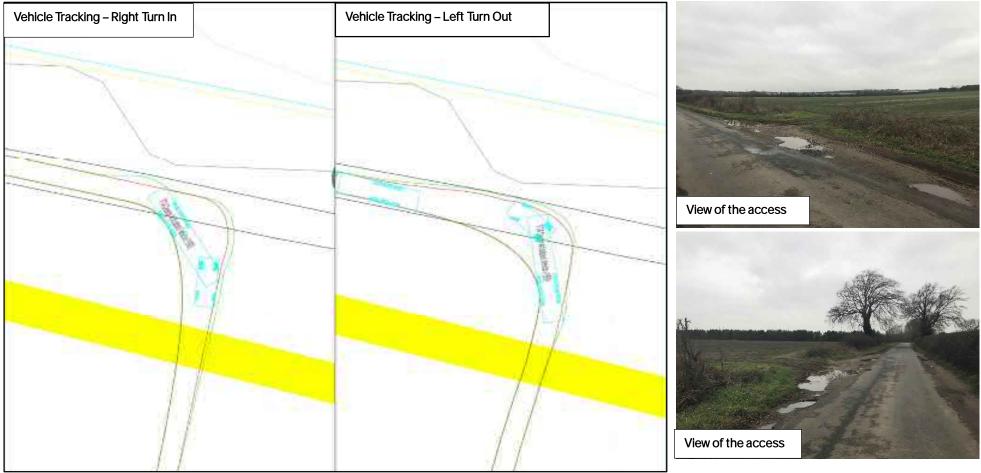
Sunnica East – Junction Works for Golf Links Road Site Access
